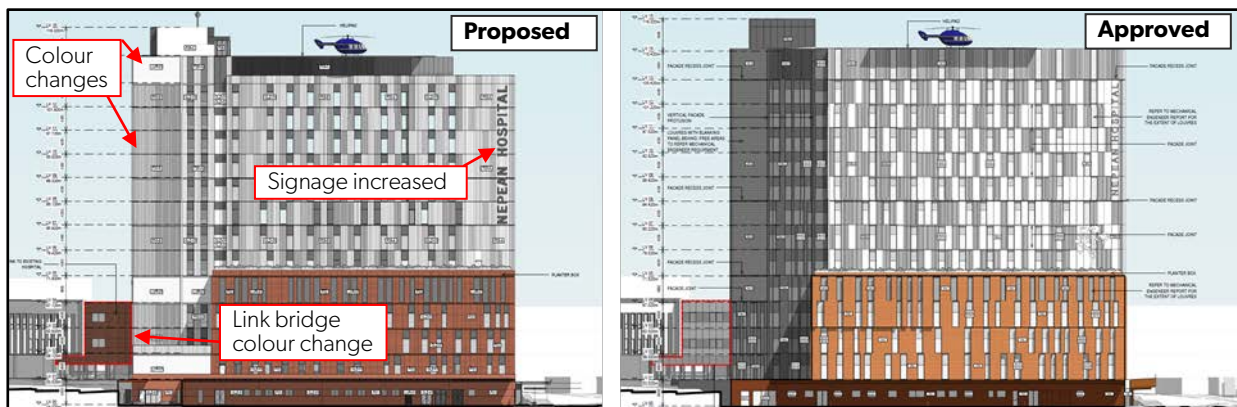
| Proposed (left) and Approved (right) Eastern Elevation (Source: Modification Application and Approved Plans)
